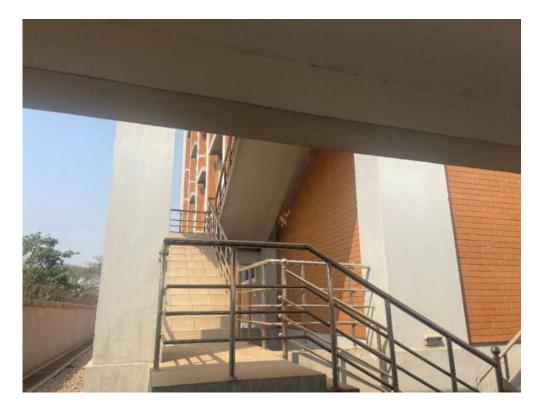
Emergency exit stairs at Purbachal S2 132/33/11 kV grid SS site
